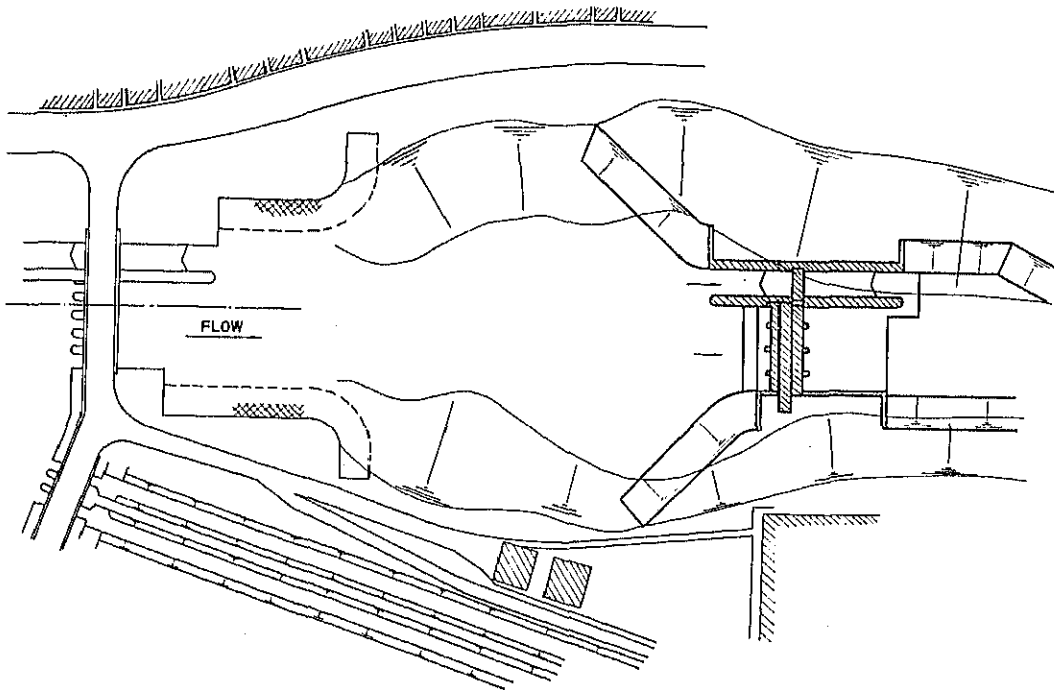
Alternative Plan of Proposed Site (Dairout Barrage)
